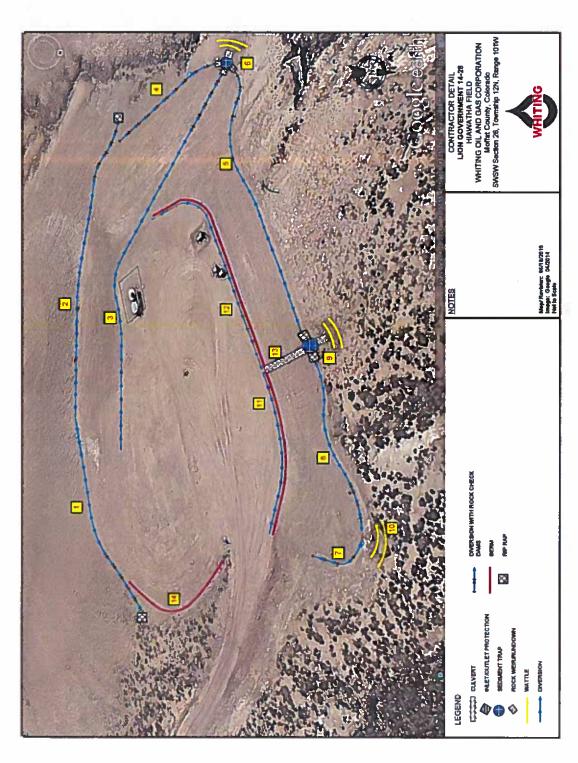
Diagram depicting stormwater features proposed for construction on Lions Government 14-26.
